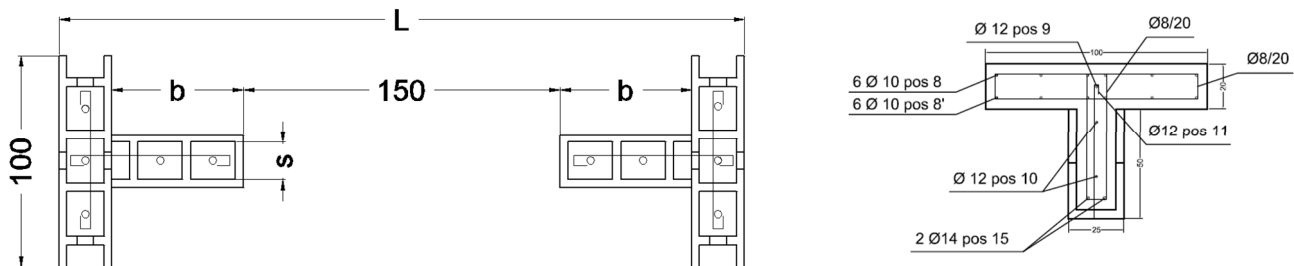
Double T section of a wall with opening (left) and lintel section (right)
